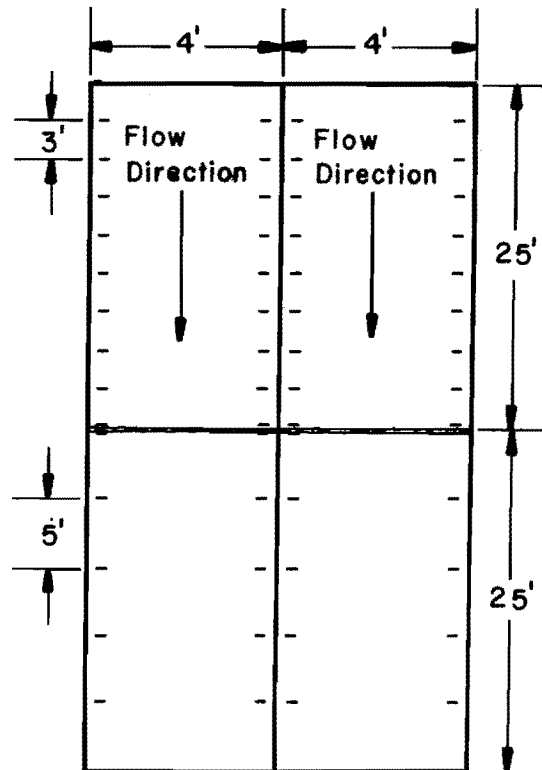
Plan view of test channels showing cross ditch and stake spacing.
